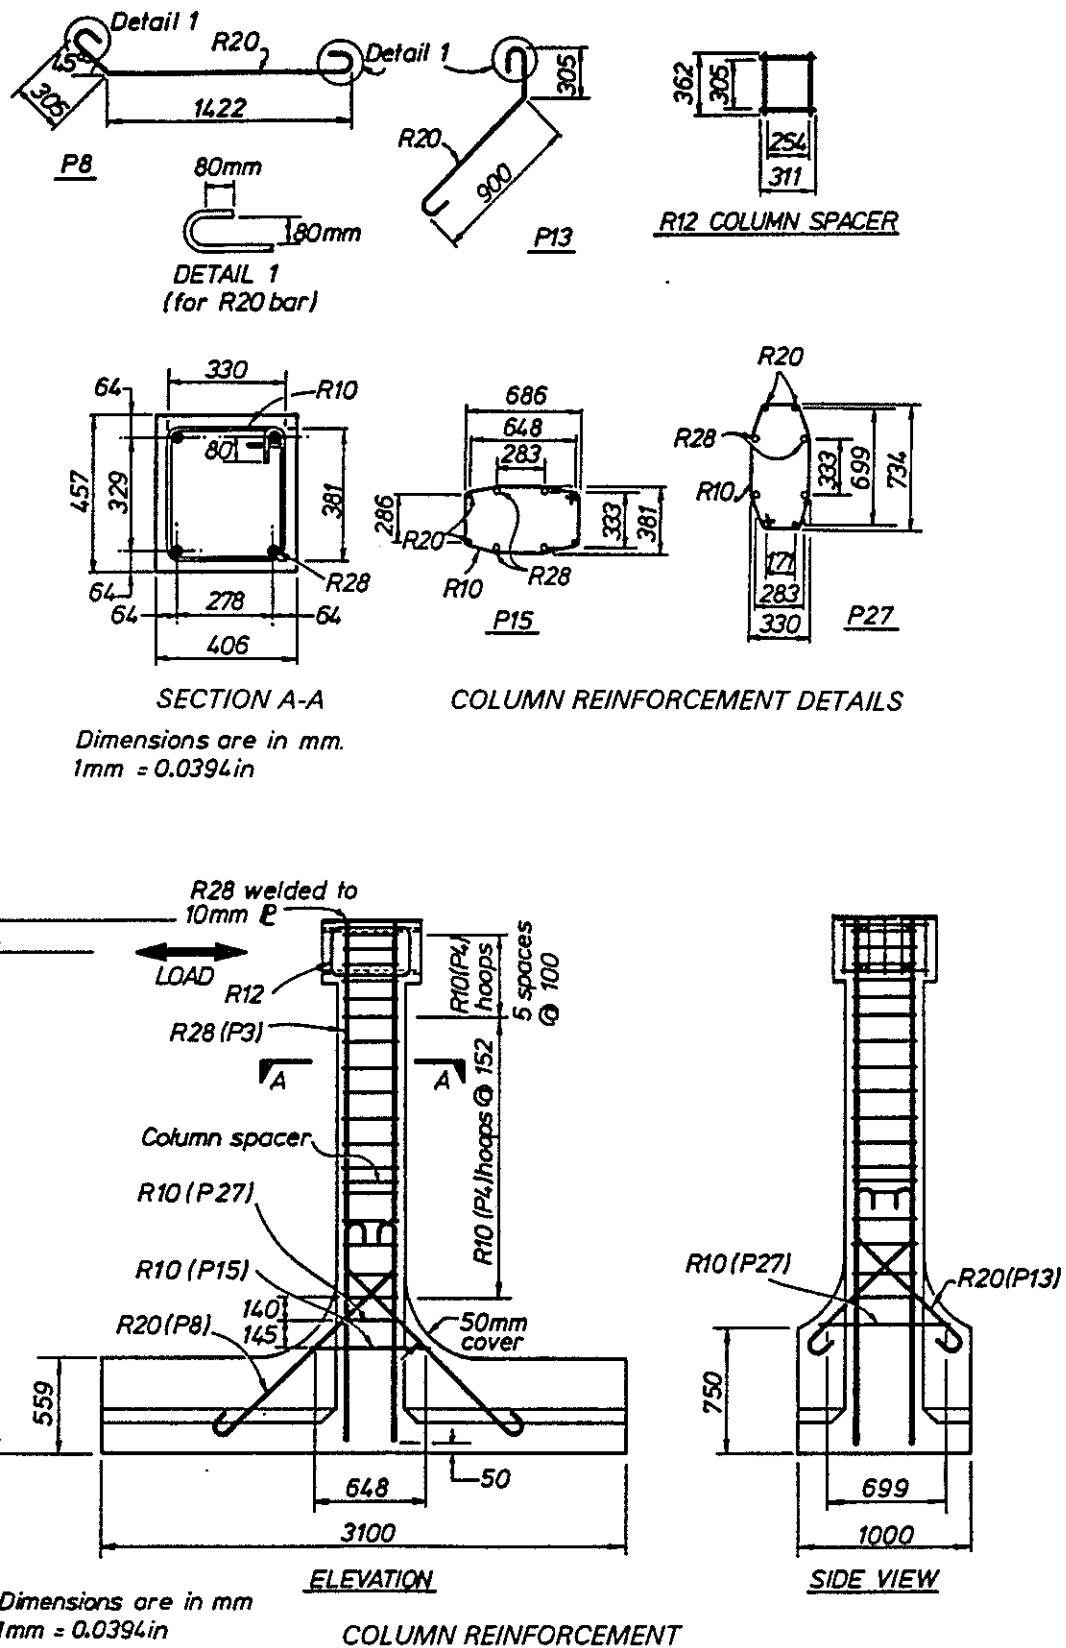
Details of column to crossbeam test specimen and reinforcing (Park et al. 1993).
